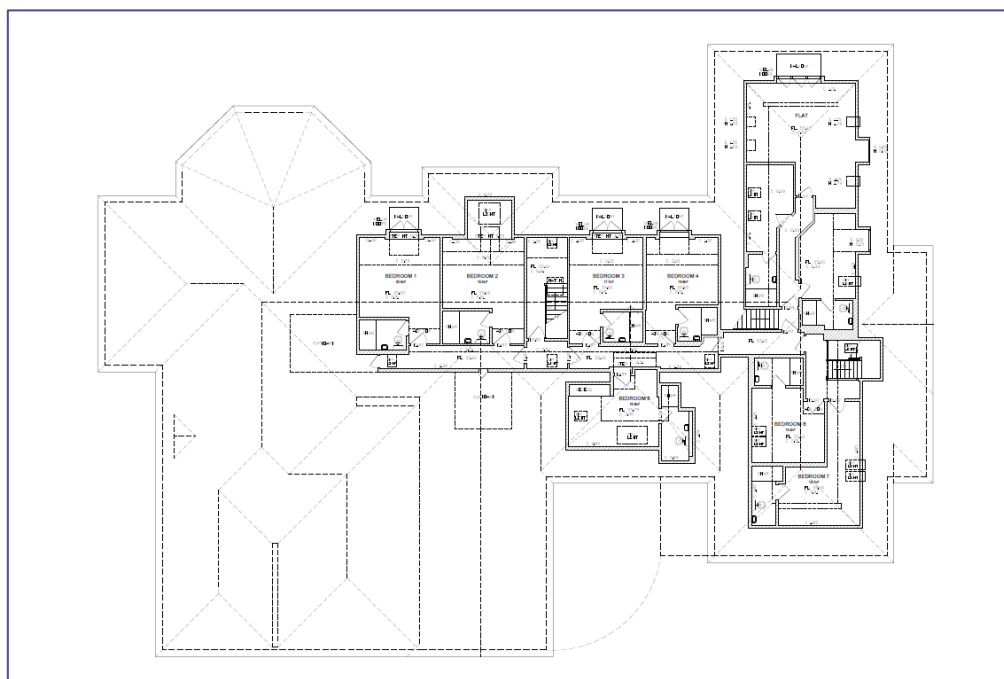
Extract from drawing no. 6309.007.A - Existing First Floor Plan - 16/0312/S73
